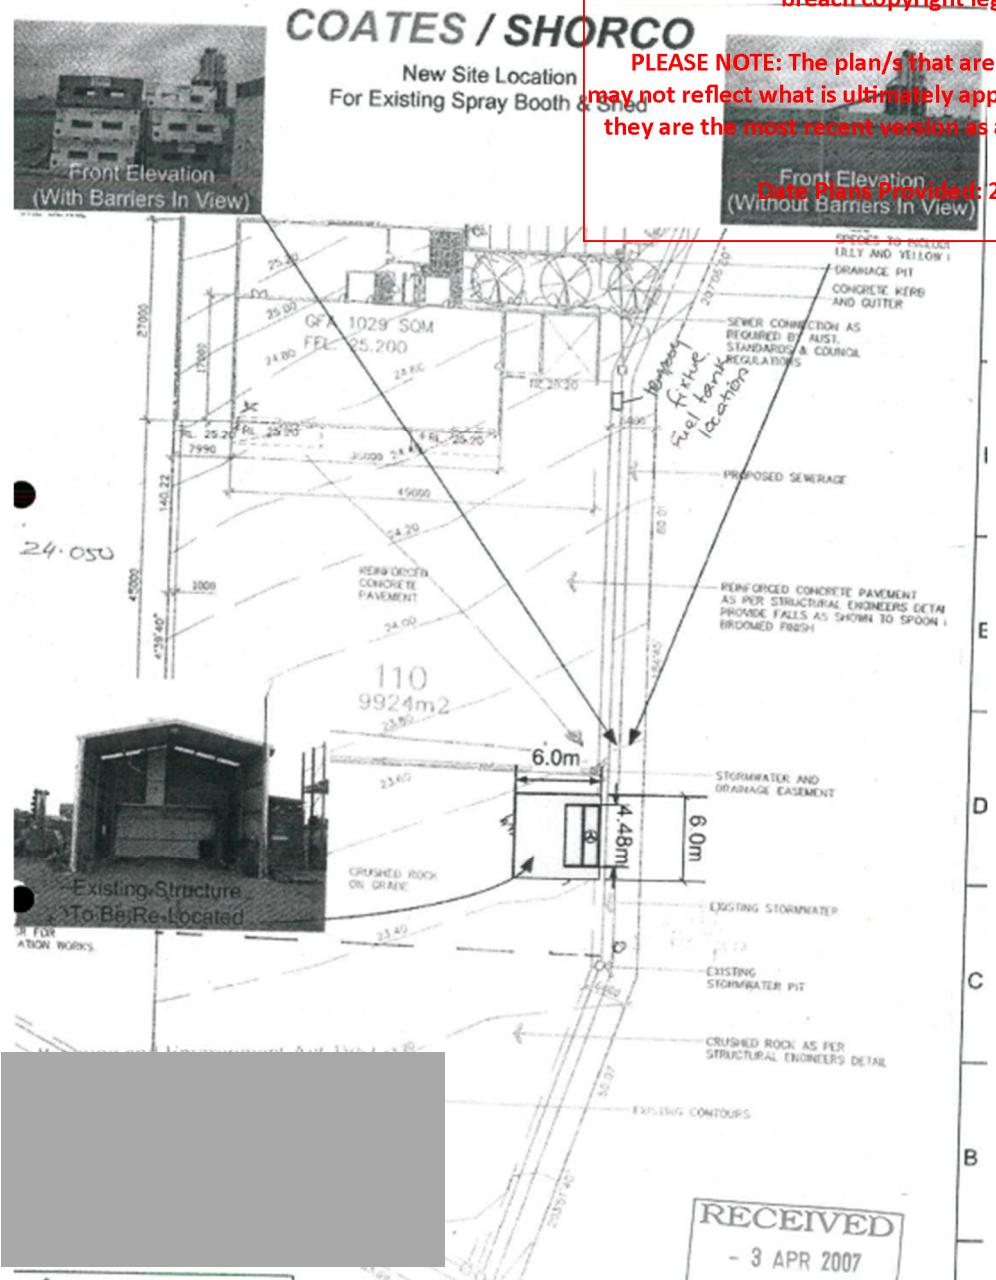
Extract of Endorsed Plan under Planning Permit WYP1217/07.
